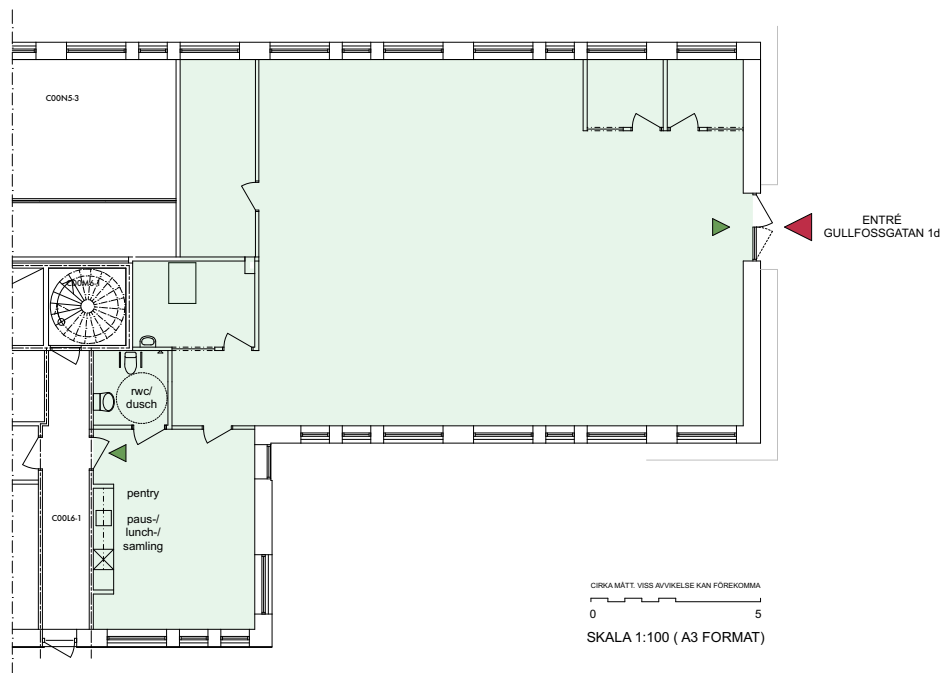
The existing floorplan of rental property Kv. Färörna. (Provided by Castellum)
